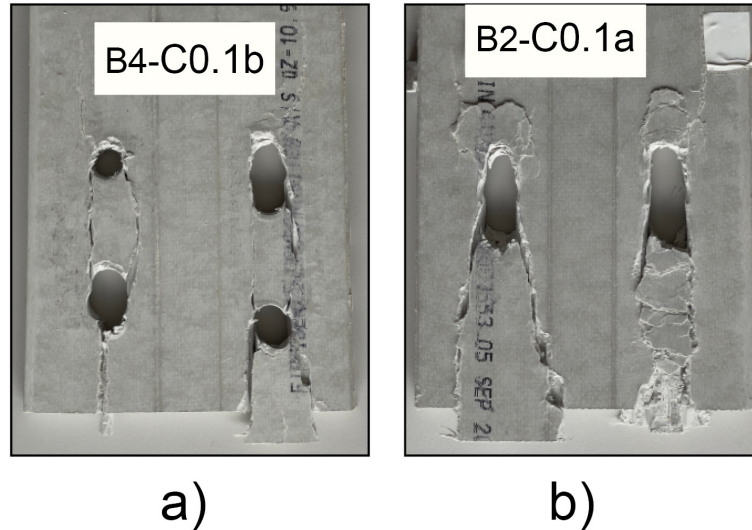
Combined crushing and shear-out failure modes of bolted joints under cyclic loading, a) B4-C0.1b b) B2-C0.1a.
